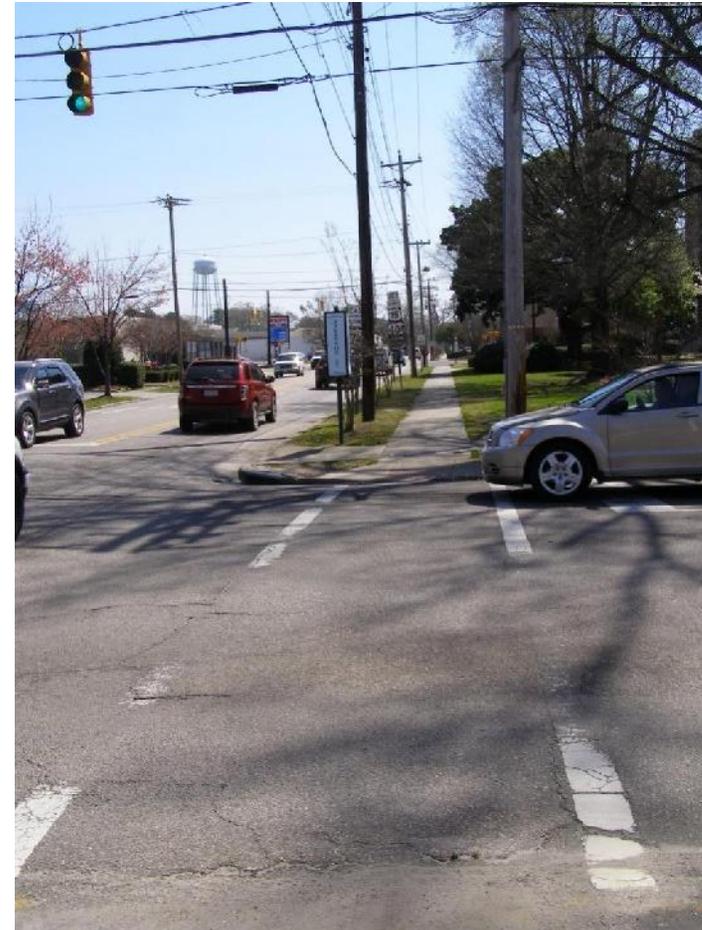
All four curb ramps at Atkinson Street and Church Street are in good condition and meet handicap guidelines. However, the existing crosswalk is deteriorating. Recommend upgrading to a high visibility crosswalk.
